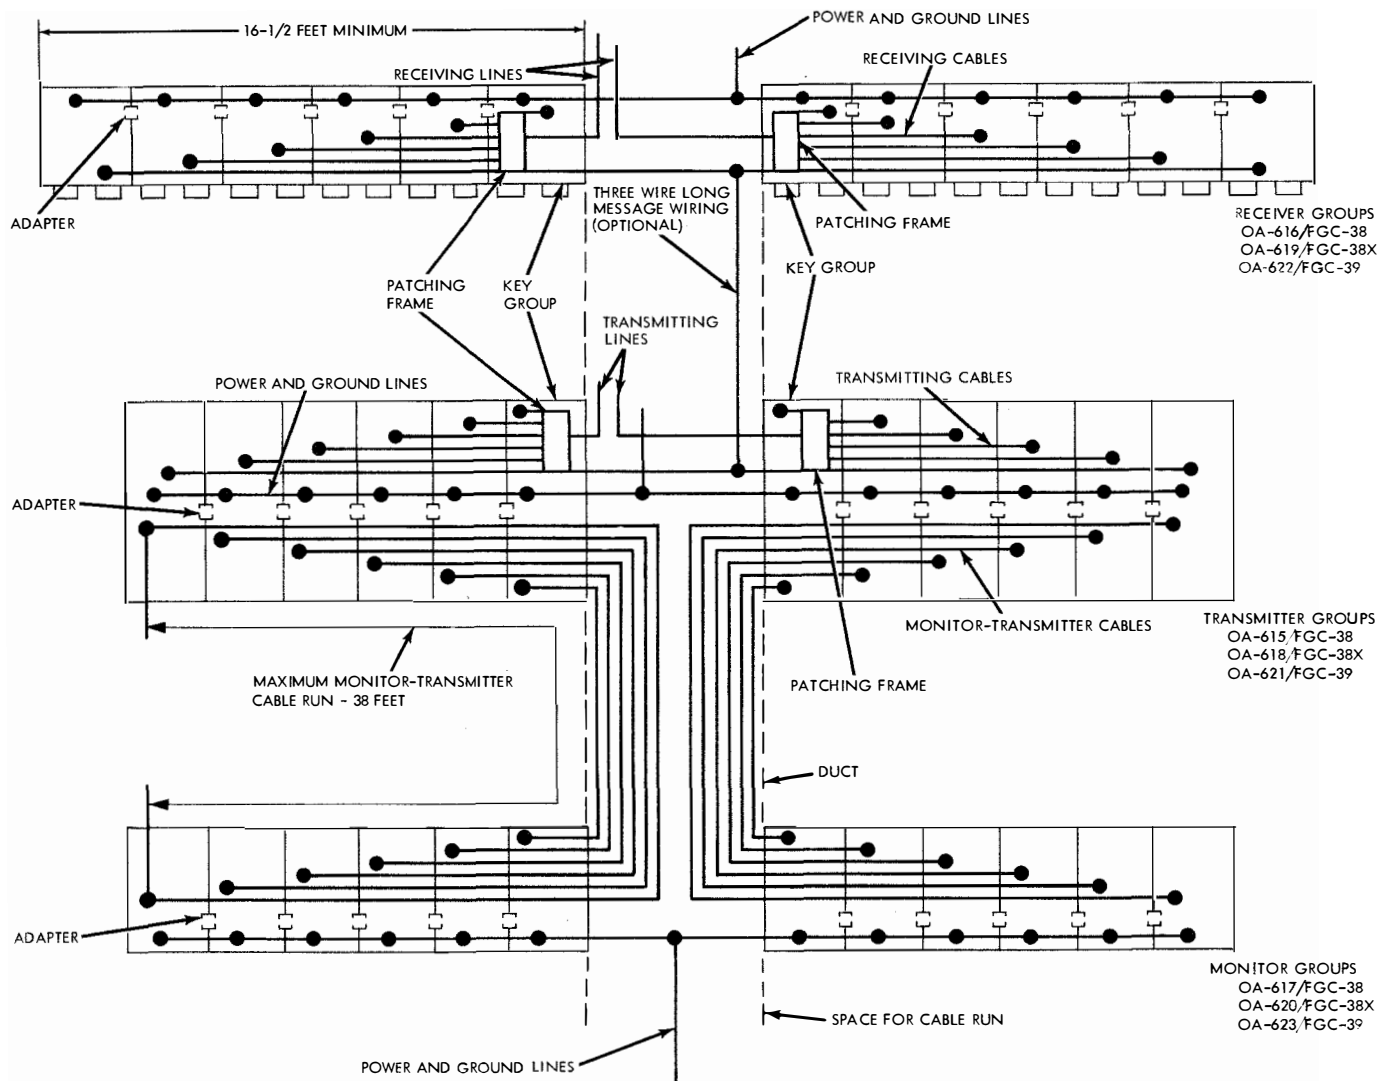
Teletypewriter Set AN/FGC-38, AN/FGC-38X, or AN/FGC-39, Office Layout Plan
